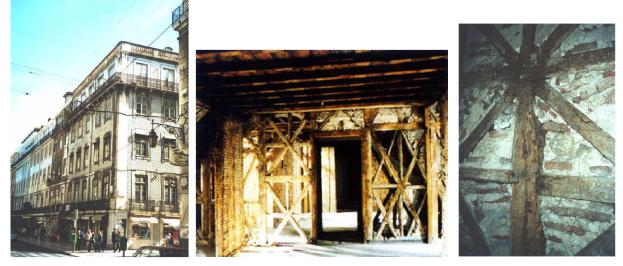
a) typical building block In the Baixa pombalina, Lisbon, Portugal; b) the cajola; c) cajola with infilled masonry
